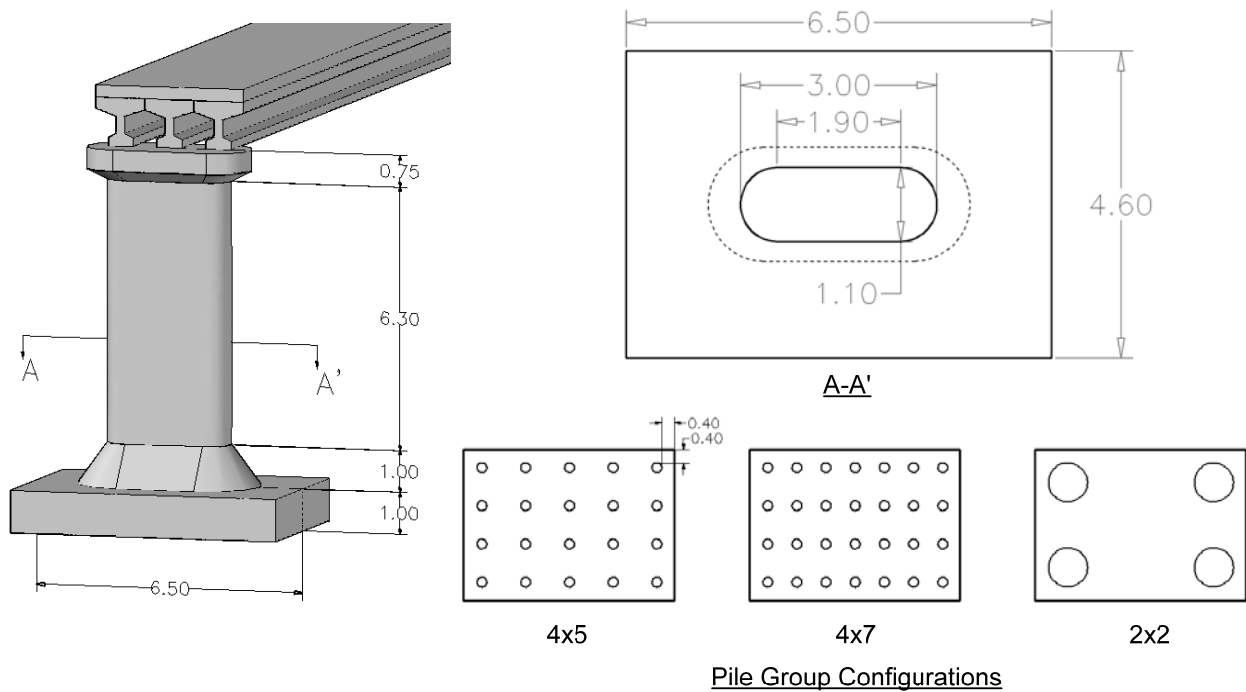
Railroad bridge member geometry and foundation group configurations considered for analysis. Clear edge spacing for all pile configurations is 0.4 m as shown for the 4×5 group. Refer to Table 4-8 for pile spacing and details used for analyses.
